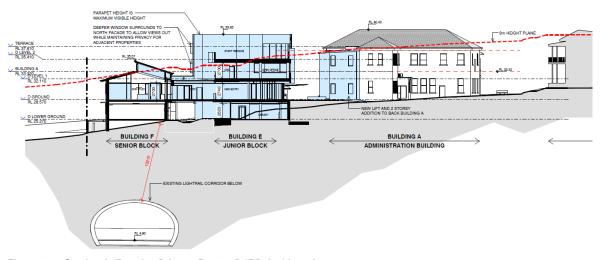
Section A (Drawing DA-250 Rev 13 DJRD Architects)
